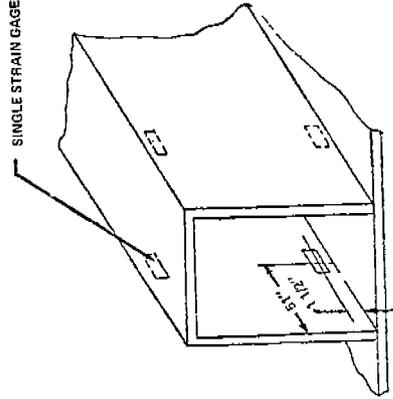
TRANSVERSE BEAM GAGE LOCATIONS
